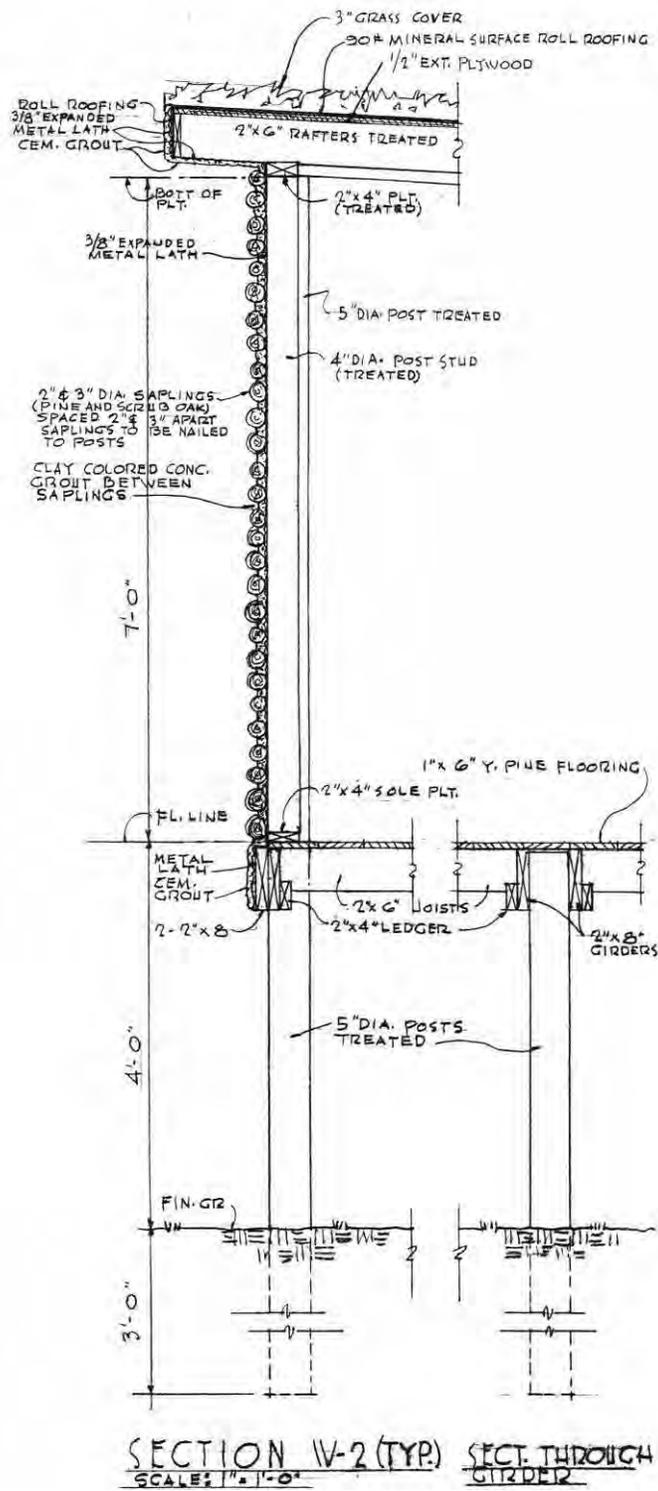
Montagnard house wall section, Camp Gordon, 1966 (standard drawing GOR 28-13-09 sheet 16, Vietnamese and Montagnard houses plans, elevations, and sections, 1 April 1966).
